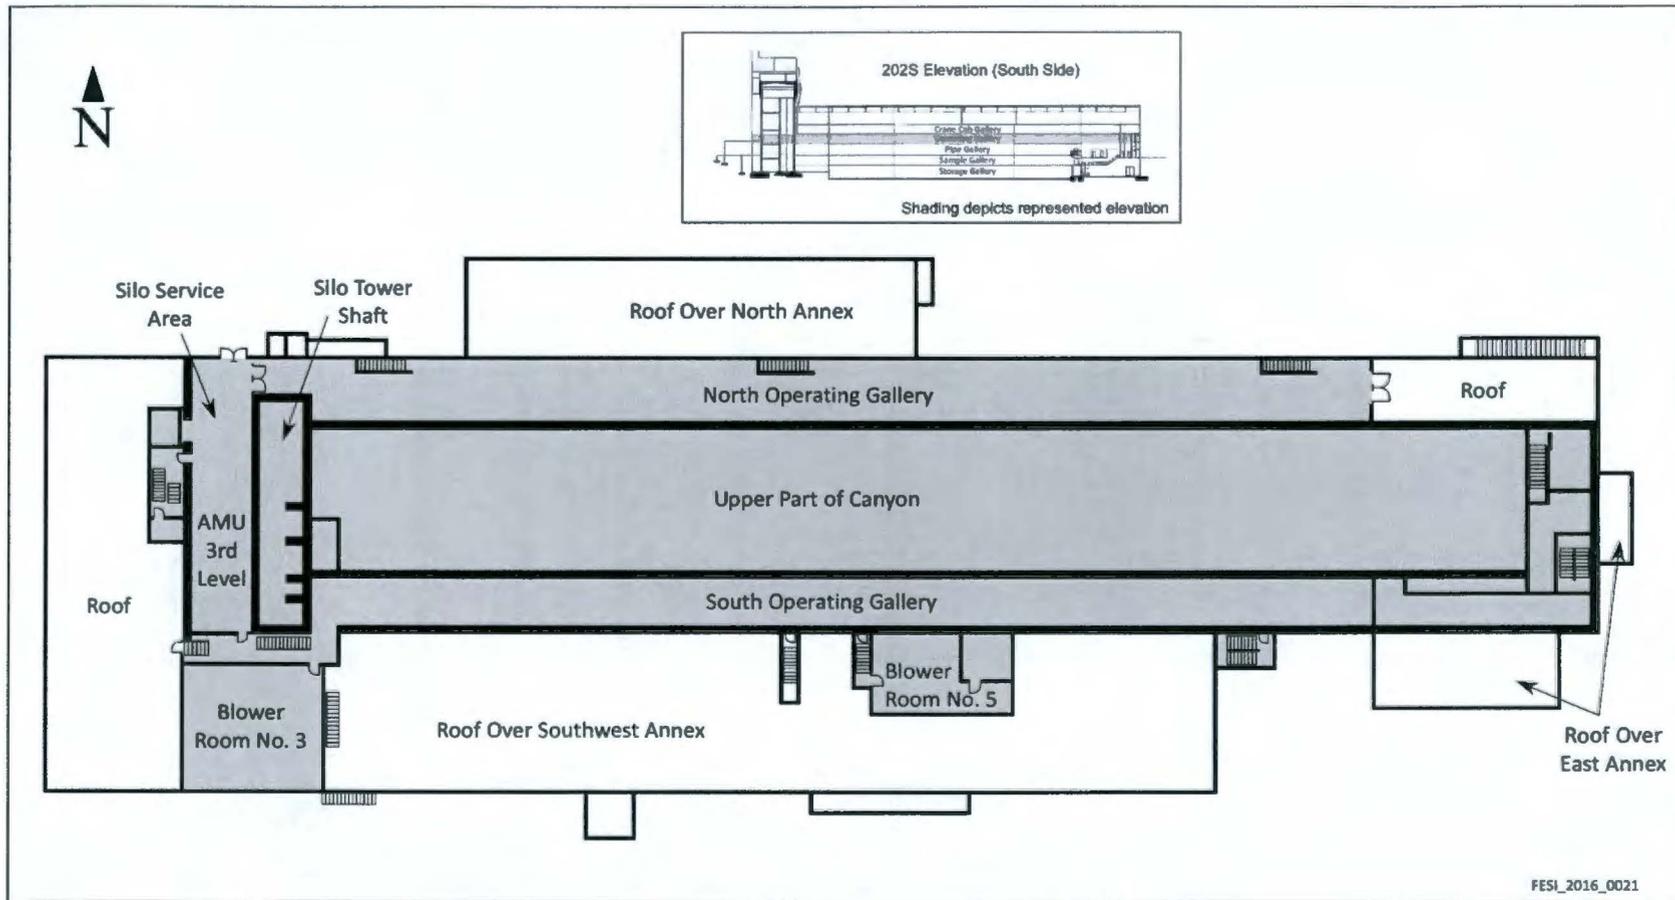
202S Canyon Building Operating Gallery Floor Level
